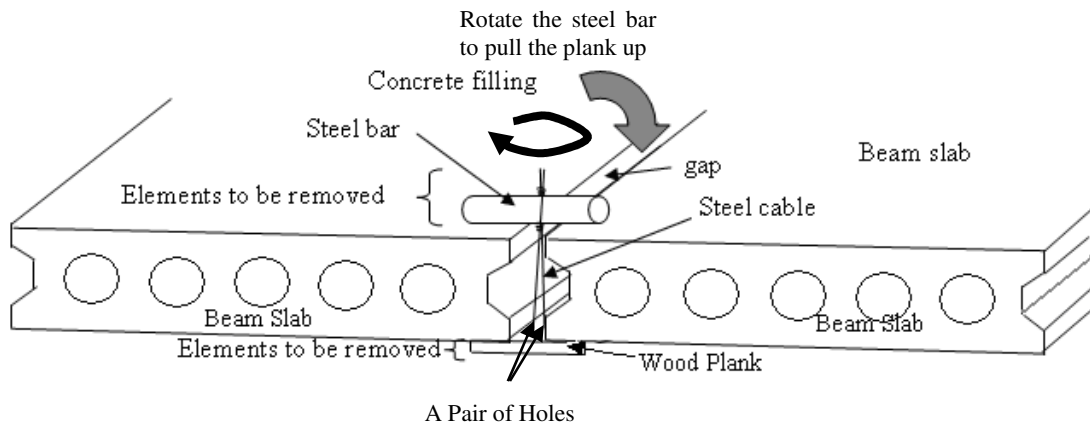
The existing method to support concrete loading in between beam slabs with steel bars, steel cables and a wood planks
